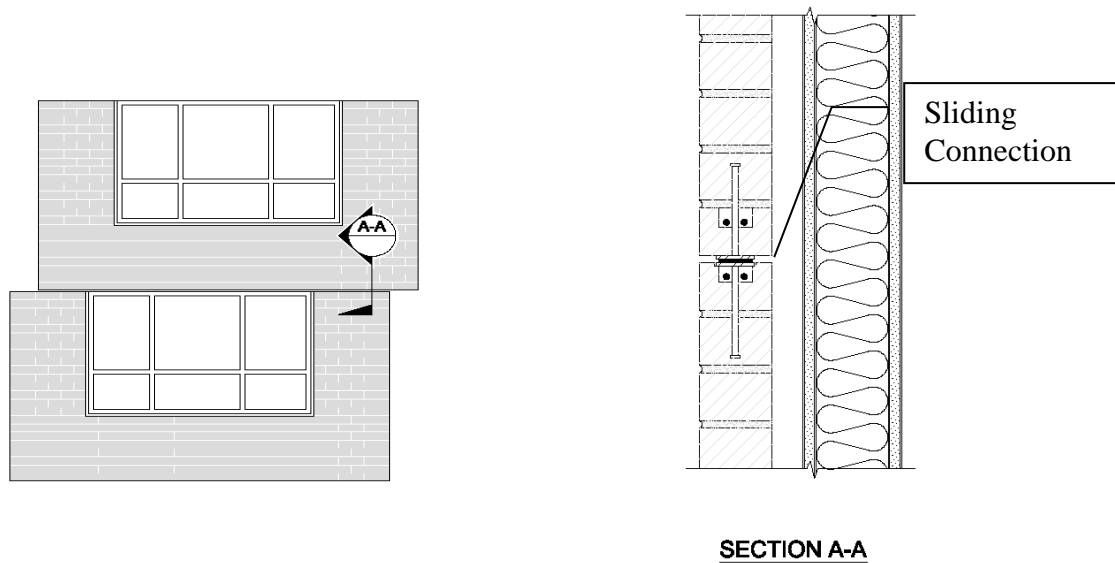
Sliding Joint; Reinforced Veneer at Sliding Joint
